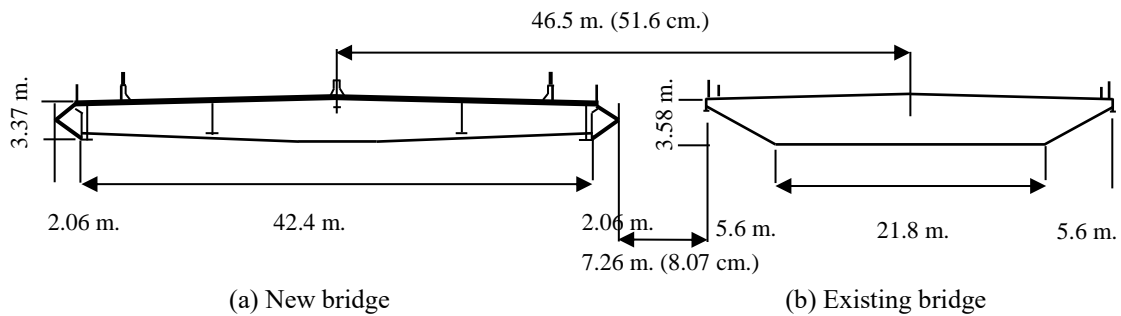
Cross section of prototype and position of two parallel bridge deck sections (Dimension for the scaled model are shown in parentheses).
